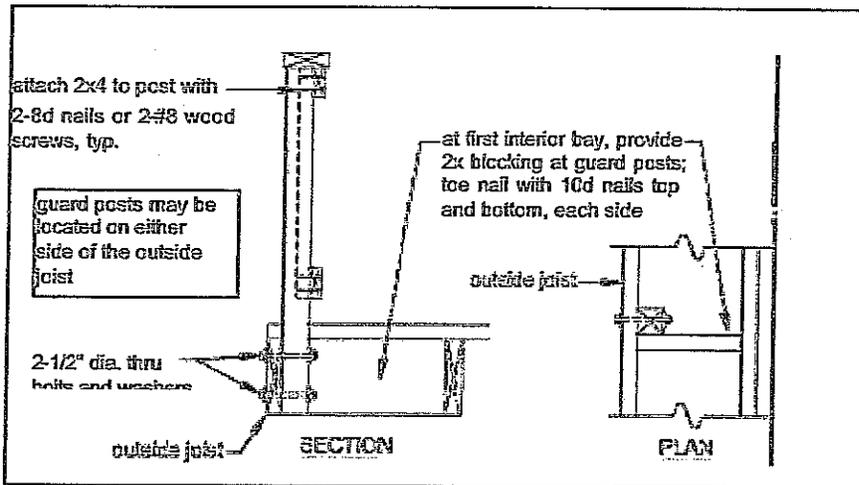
GUARD POST TO OUTSIDE JOIST DETAIL
